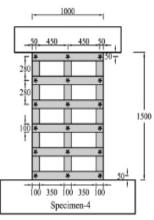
Exterior Shear Walls bonded with steel strips in different positions and quantity (Shaded area denotes steel strips)
